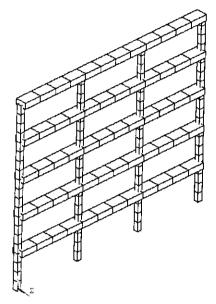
Equivalent 2-D Model of Typical Slab with column line beam
